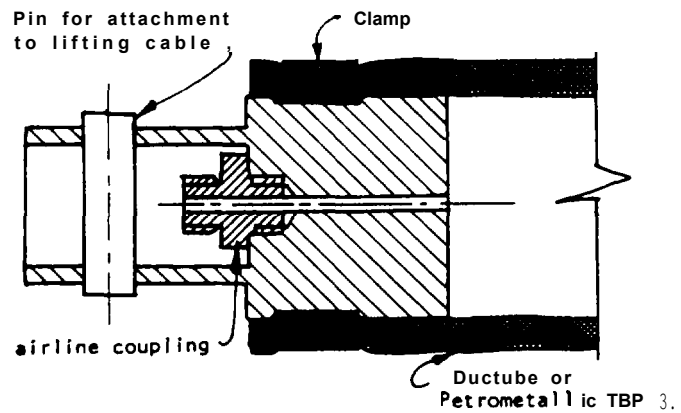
Section through the end of a packer for sealing the bottom end of a pumping test cavity. The upper packer end has additional fittings for pressure inlet and piezo-meter cables.
